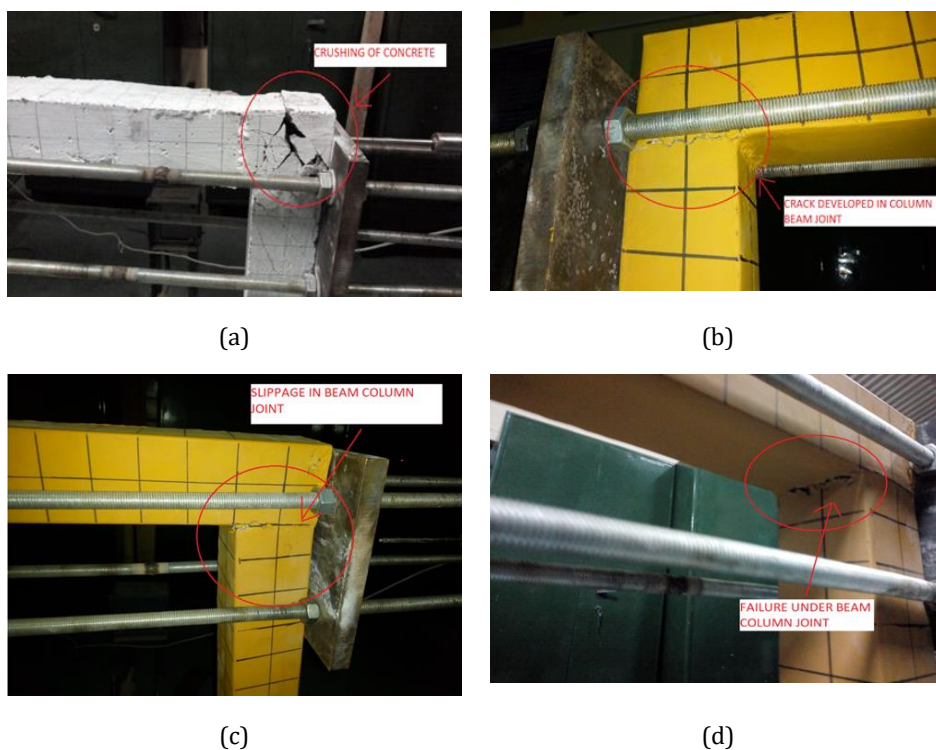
(a) Failure of bare frame, (b) Failure of SP-75 (c) Failure of SP-100 (d) Failure of SP-125
